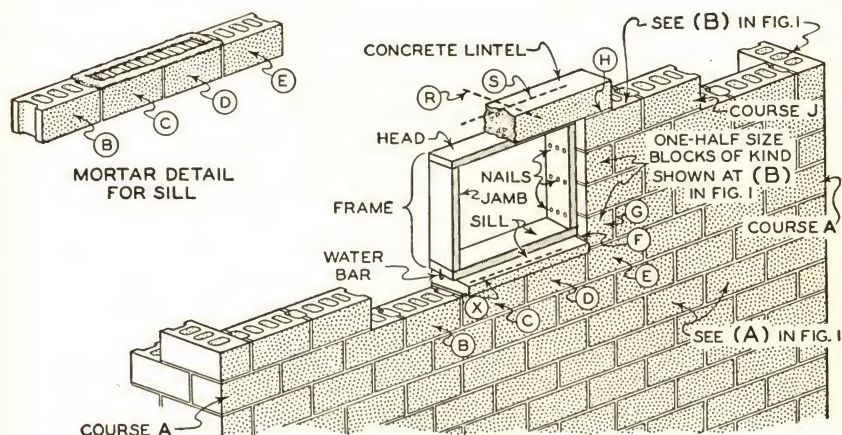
Part of One-Room Milkhouse Wall Showing Window, Sill, and Lintel
